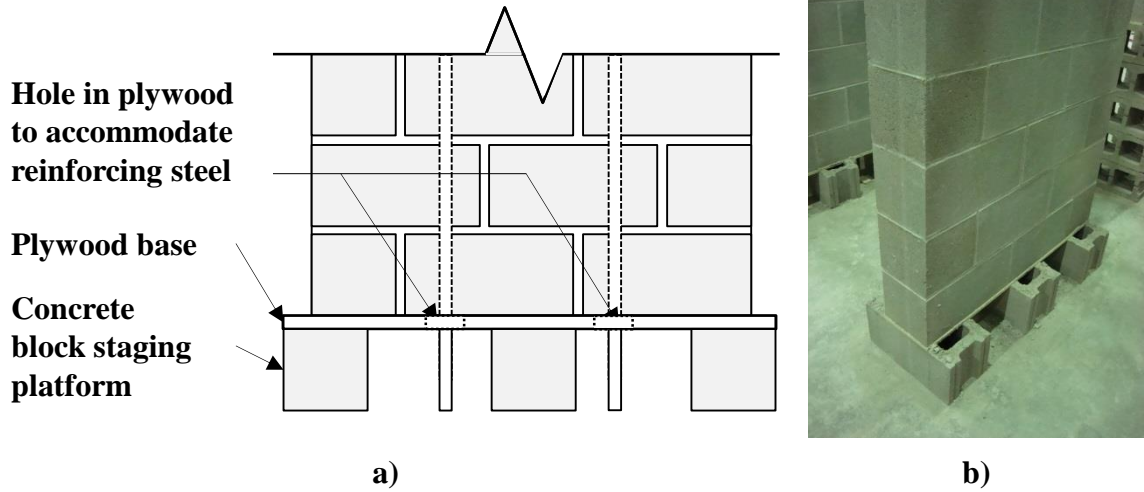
Wall splice specimen bases: a) illustration, and b) as-built photo (Note: Base for 2.5 block wide specimen shown)
